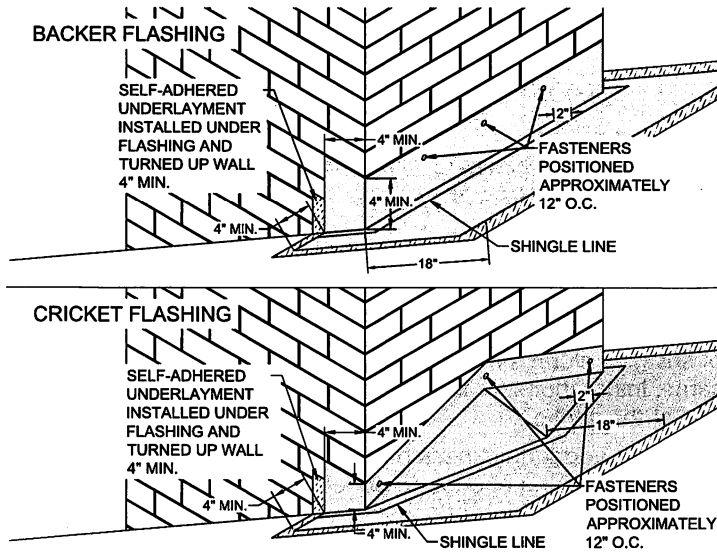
Chimney Saddle and Cricket Flashing Applications
